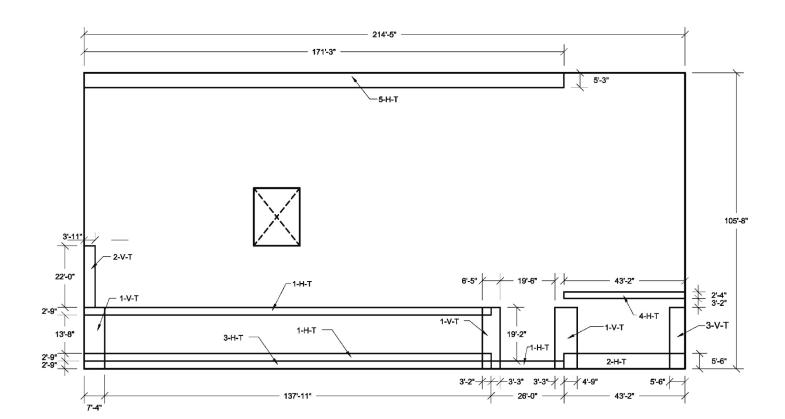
H.3-17 South Wall Looking North Transverse Reinforcement Zones
